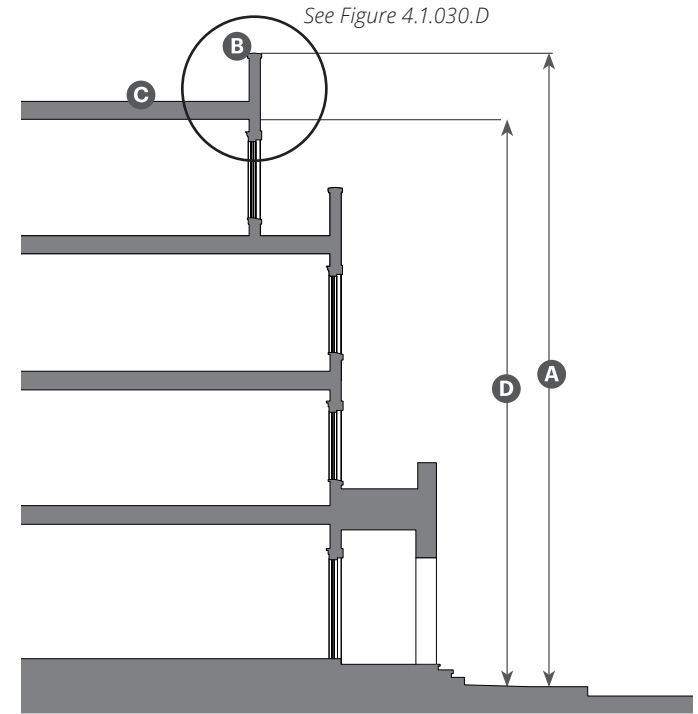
C Highest Top Plate for parapet and flat roof.
